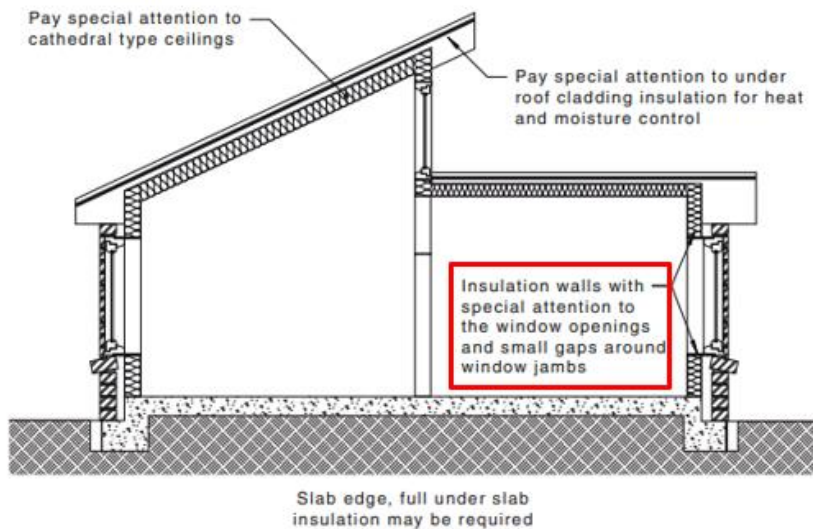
EXAMPLE OF THERMAL ENVELOPE WITH SLAB ON GROUND
